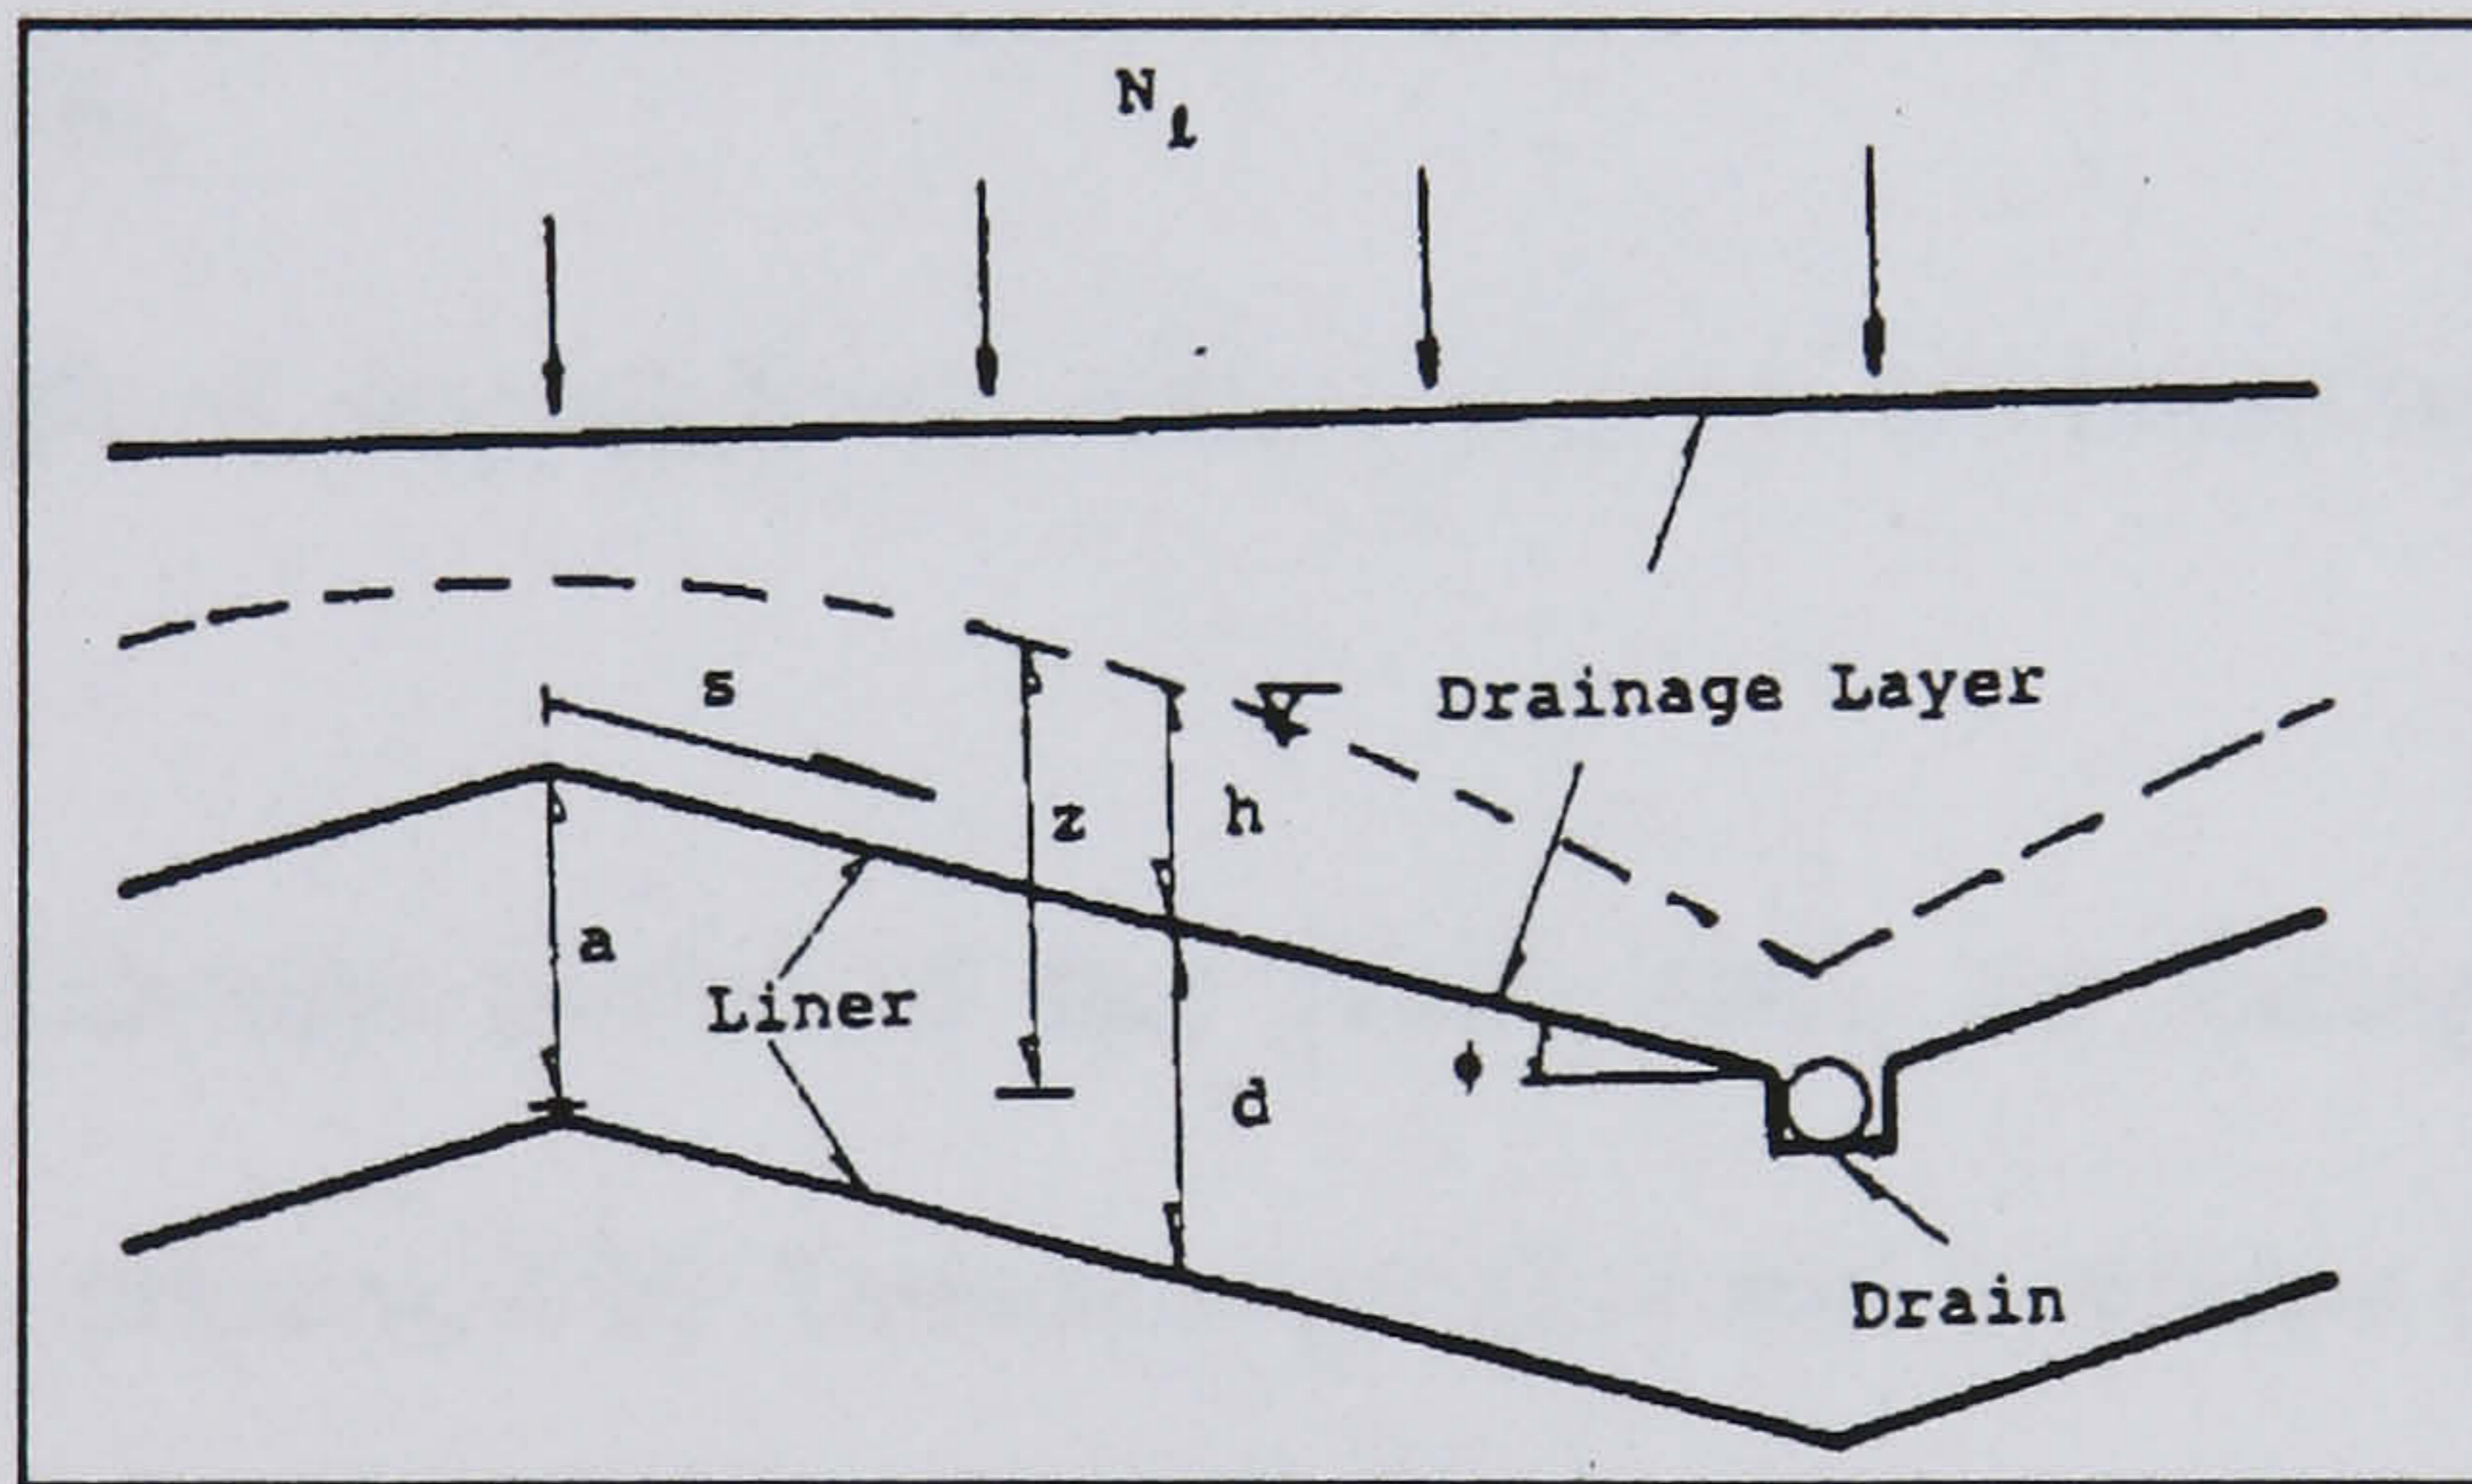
Longitudinal Section of Sloping Liner and Leachate Collection System.
